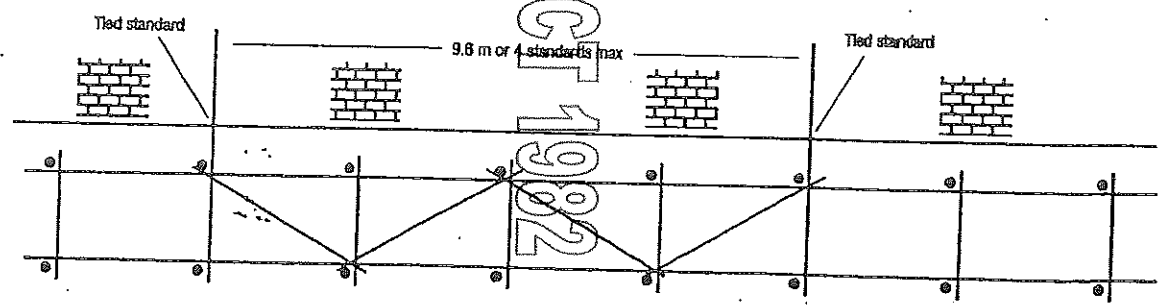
(a) Plan bracing where horizontal tie distance is excessive. Note that substantial ties are required.
